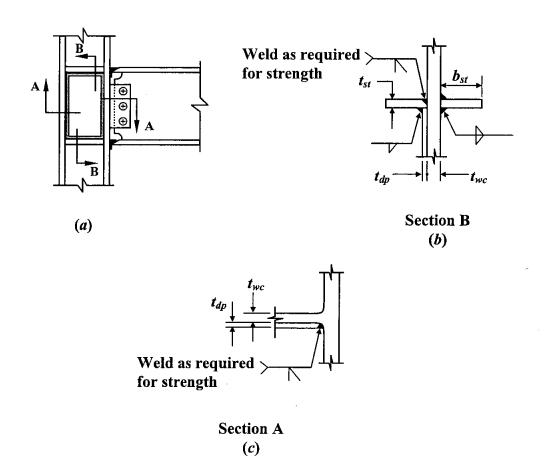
Reinforcement of web panel-zone by doubler plate.
